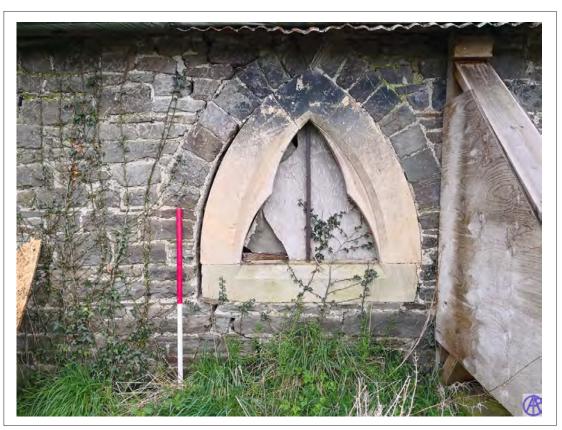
View of Second Decorative Window in South-East Elevation, Looking north-west Scale $1\mathrm{x}2\mathrm{m}$
